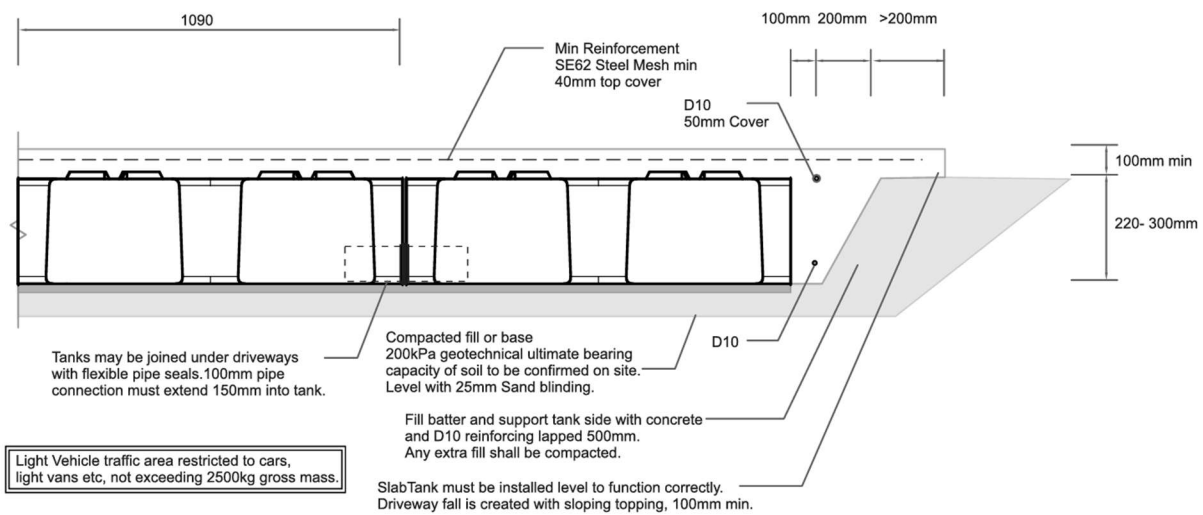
PERIMETER DETAIL - SLABTANK™ DRIVEWAY
